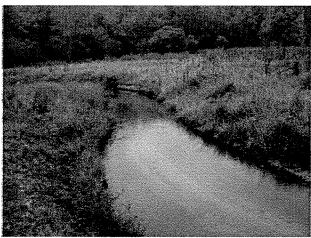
Looking upstream at rock cross vane installed at MS Station 27+33. (9/27/04)
